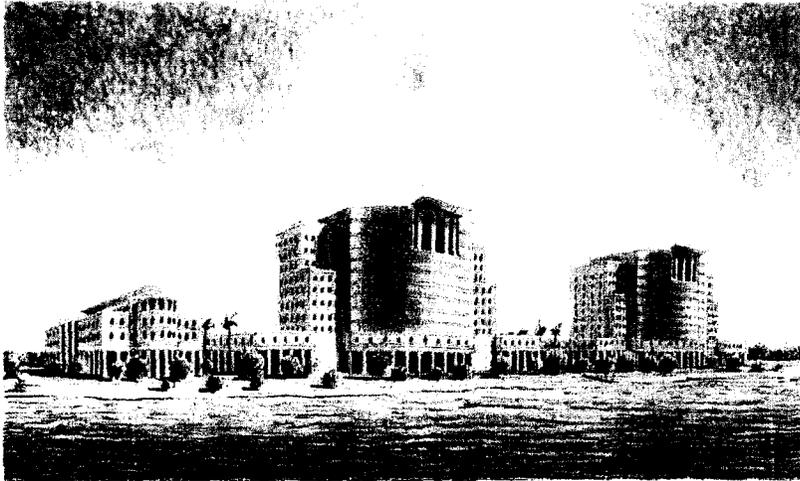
Congress Avenue Mixed-Use Buildings
